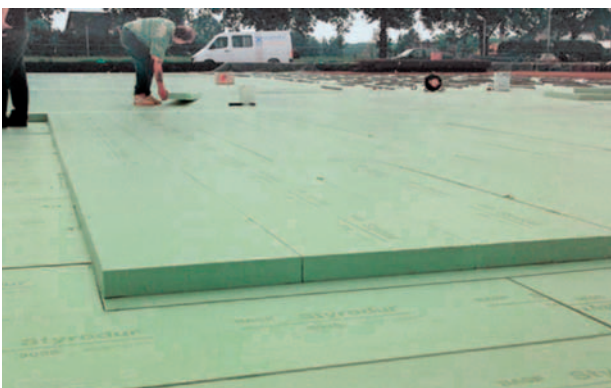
Multilayer installation of Styrodur® C boards under the floor slab according to DIBt approval Z-23.34-1325.
